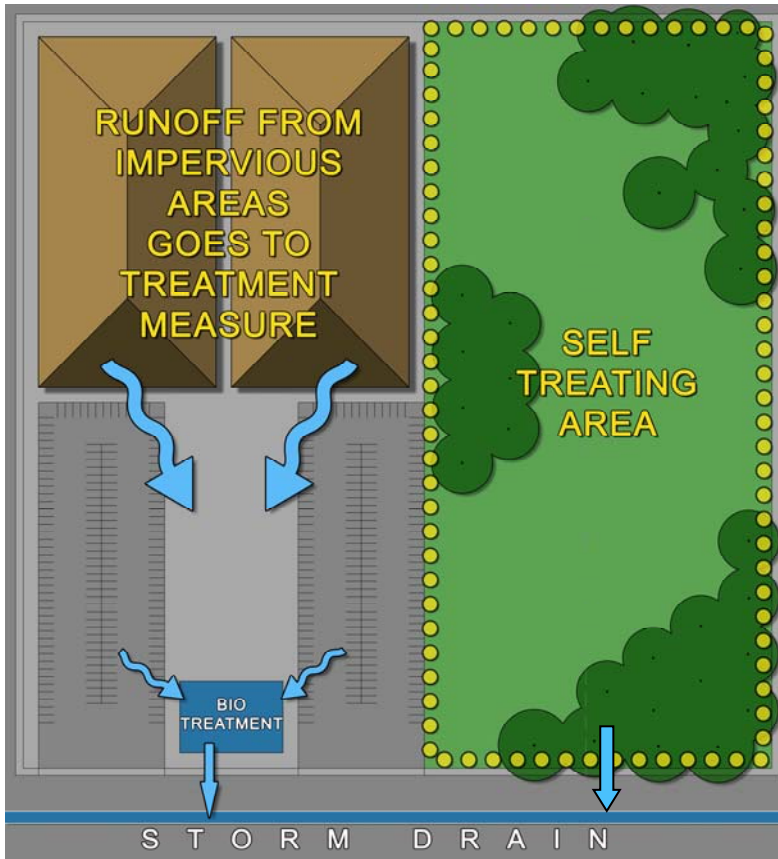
Schematic Drainage Plan for Site with a Self-Treating Area
